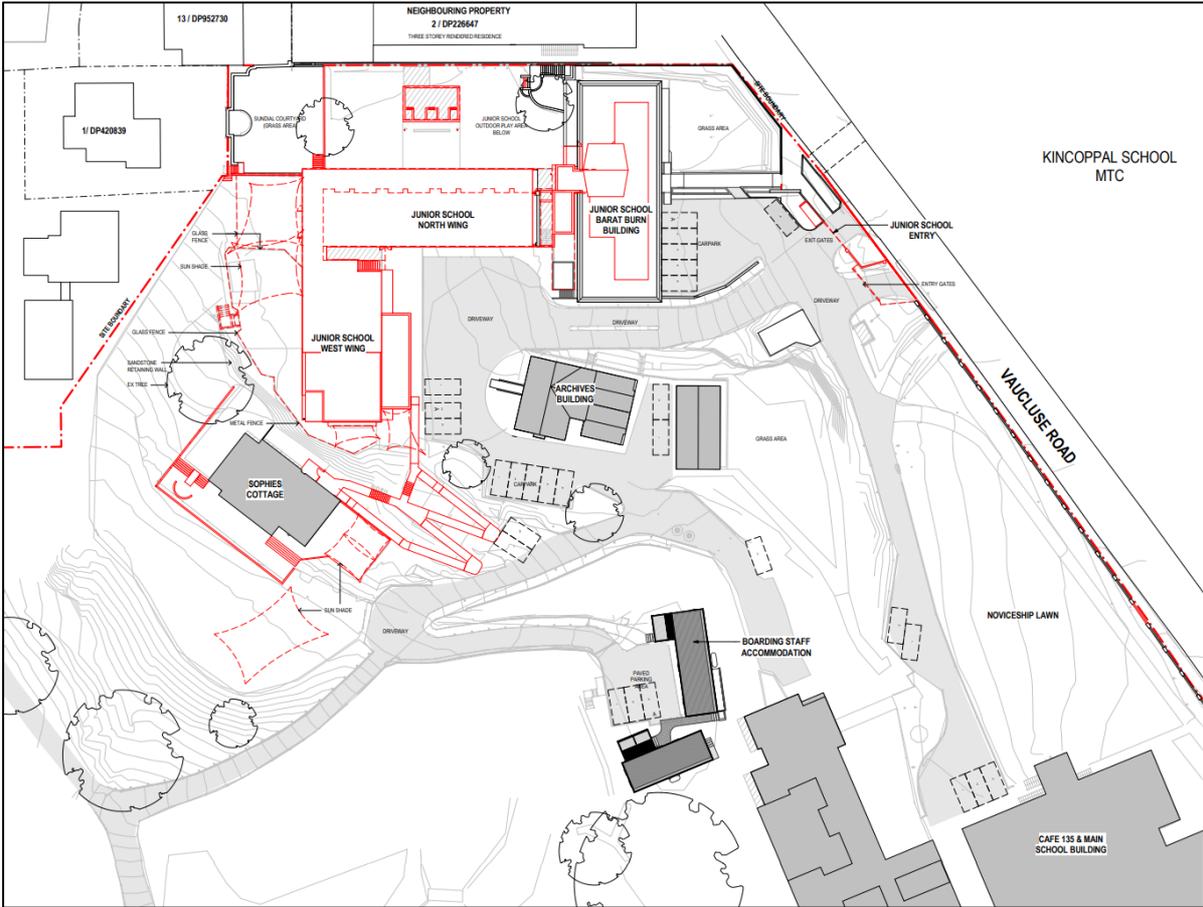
| Precinct A demolition plan (Source: Applicant's RtS 2021)
